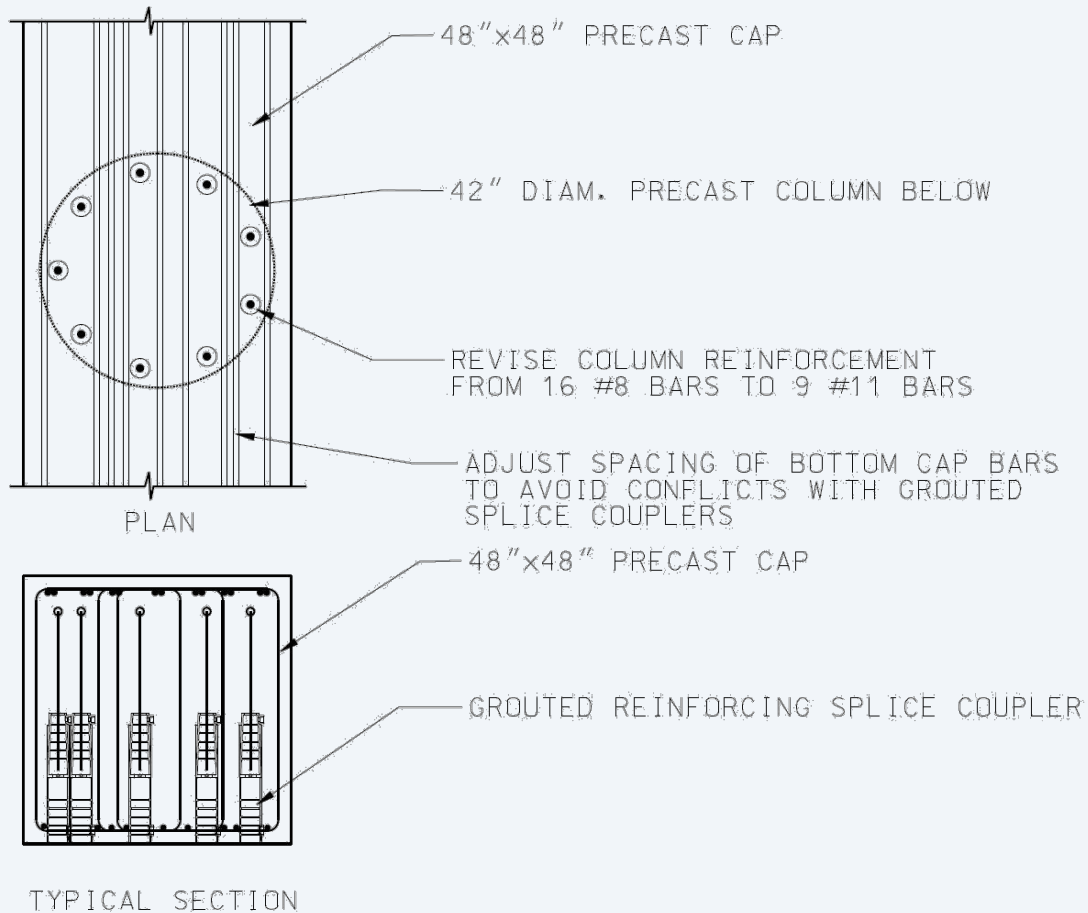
Conflicts With Grouted Couplers and Cap Reinforcement.
